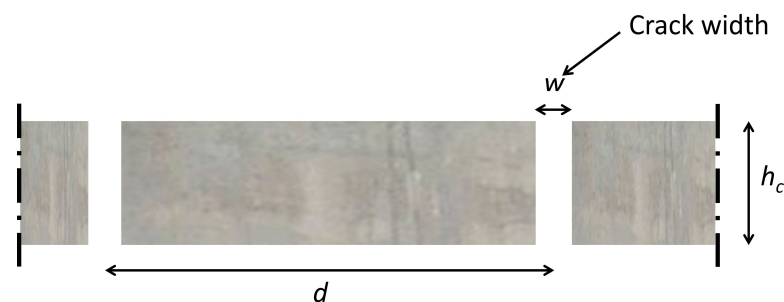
Cross-section of the considered concrete lining having a thickness h_c .
